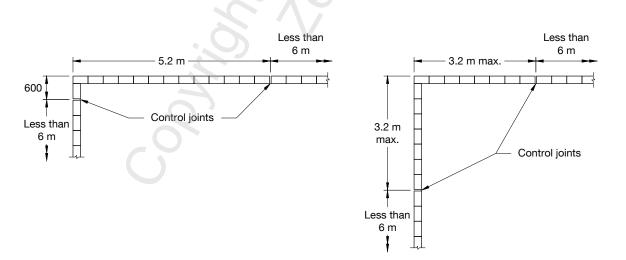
Location of control joints for shrinkage (see 12.1.1)
